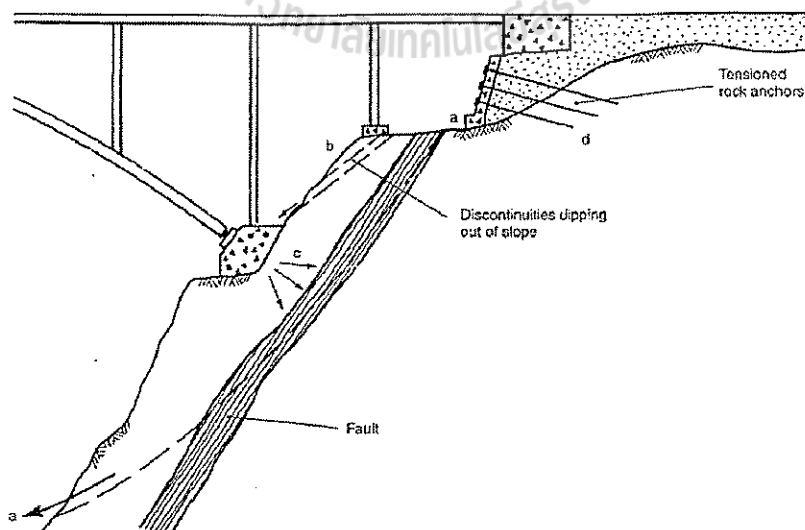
Stability of bridge abutment founded on rock: (a-a) overall failure of abutment on steeply dipping fault zone; (b) shear failure of foundation on daylighting joints; (c) movement of arch foundation due to compression of low-modulus rock; and (d) tied-back wall to support weak rock in abutment foundation.
